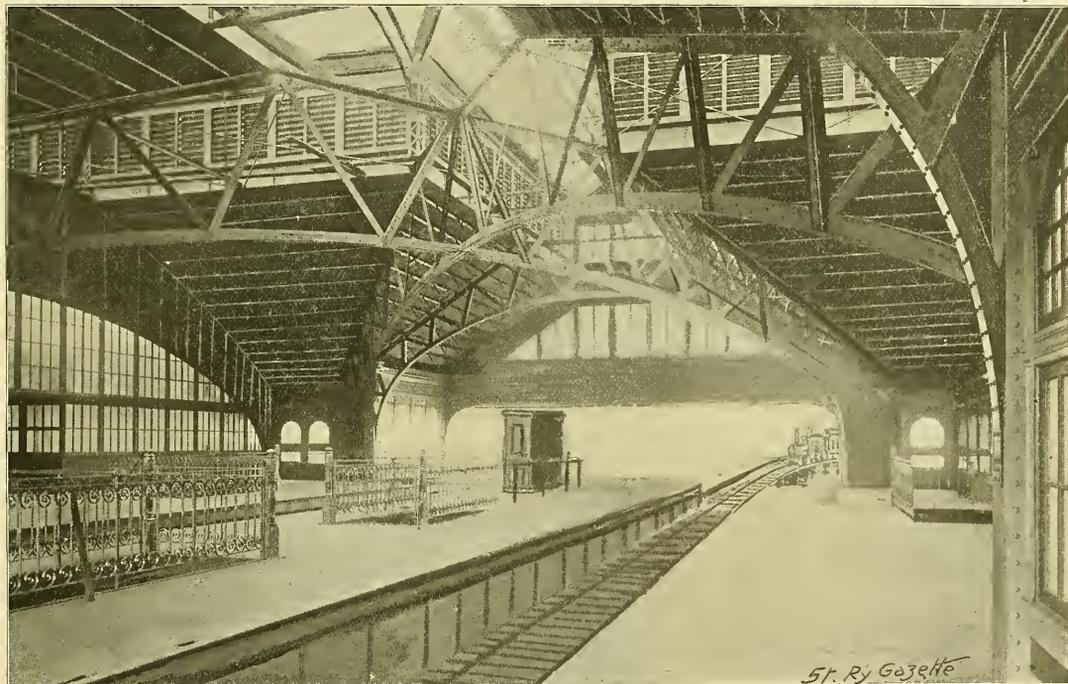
SECTION OF TERMINAL BUILDING, SHOWING ELEVATED RAILWAY PLATFORMS AND TRACKS.
